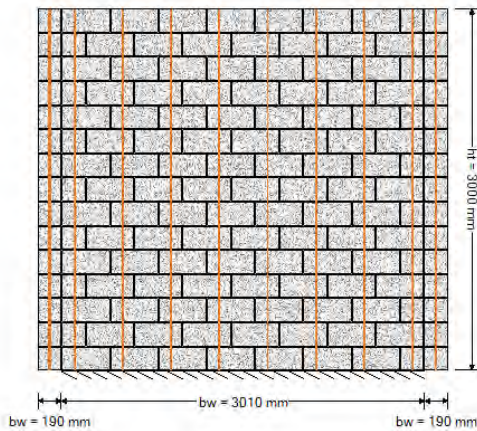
Assemblage drawing of a Shear Wall with Flanges
